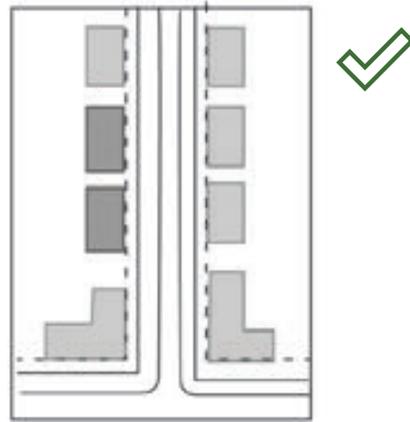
Buildings should follow the common building line and be oriented towards the street
